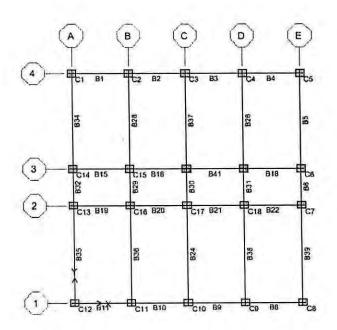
Plan of a typical cyclone shelter funded by Saudi Arabia
